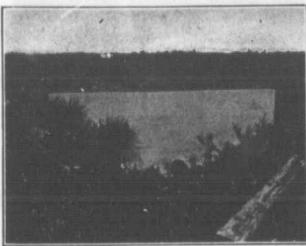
A Tile Drain Protected by a Concrete Wall
